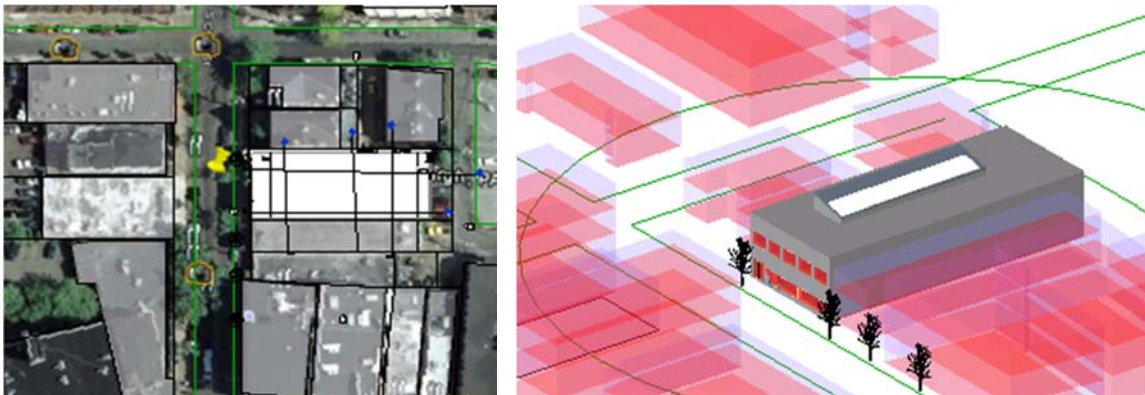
407 S Craig St, site plan and massing (left), 3D view (right)
